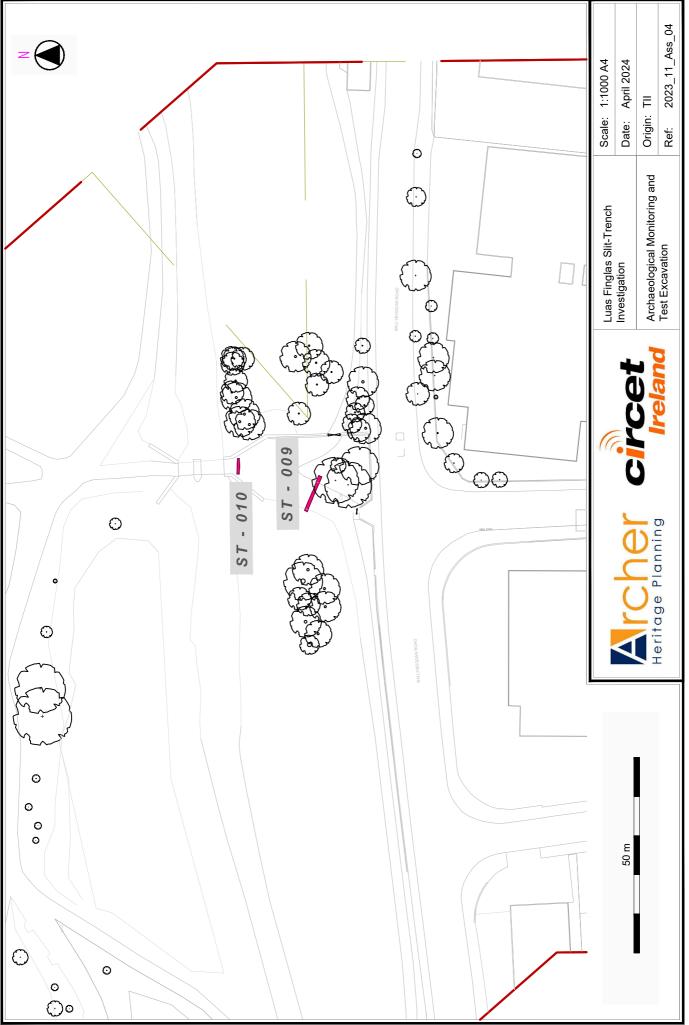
Detailed Utility Slit Trench Location Plan (ii)
